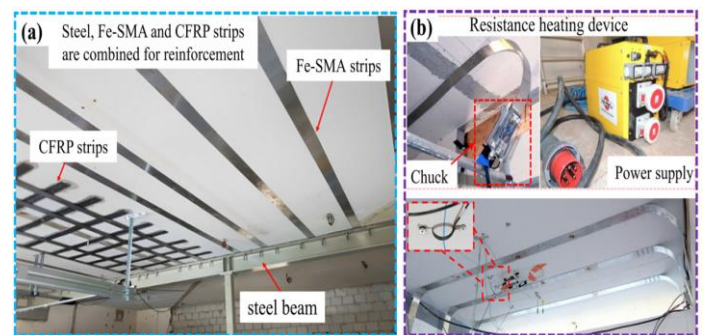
Fe-SMA-RC slabs: (a) example of reinforcing following the elimination of a load-bearing wall; (b) crack control of concrete slabs [100].
